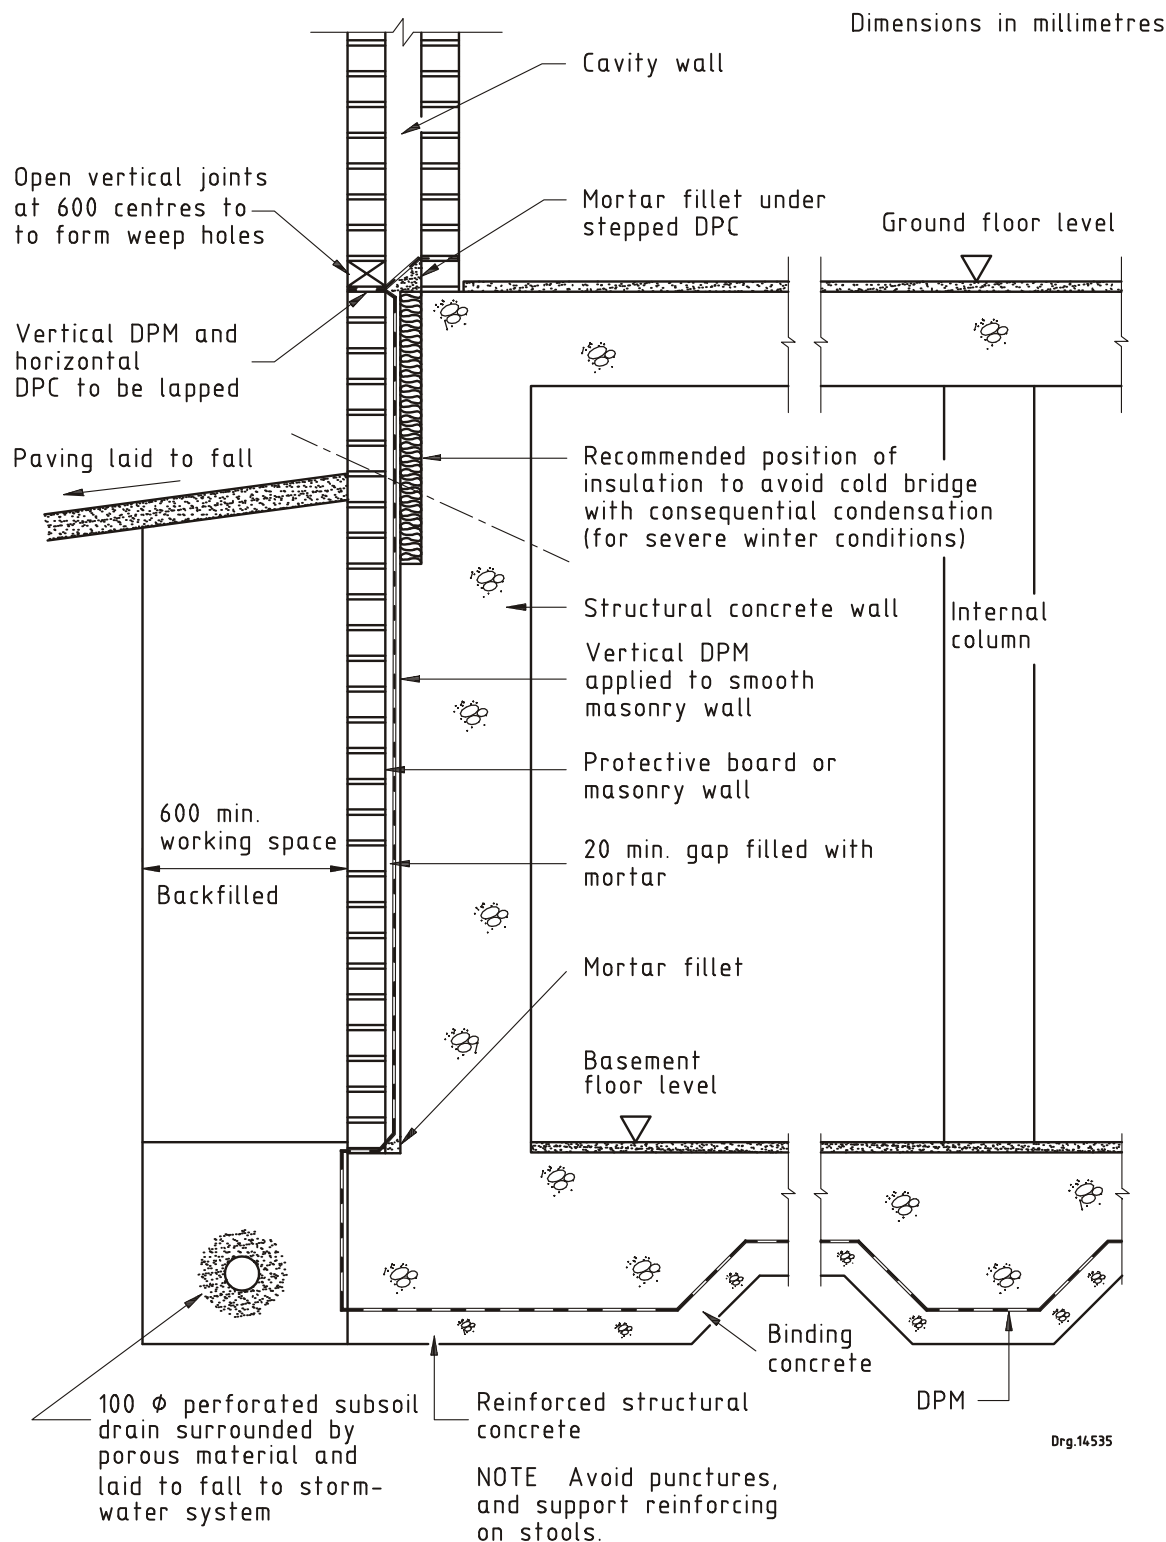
Externally tanked concrete basement with pressure relieving drain
